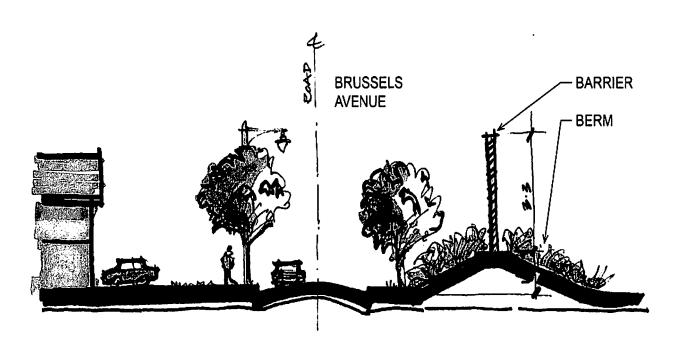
Cross Section of Brussels Avenue with 3.3 m Barrier on 1.77 m Berm
